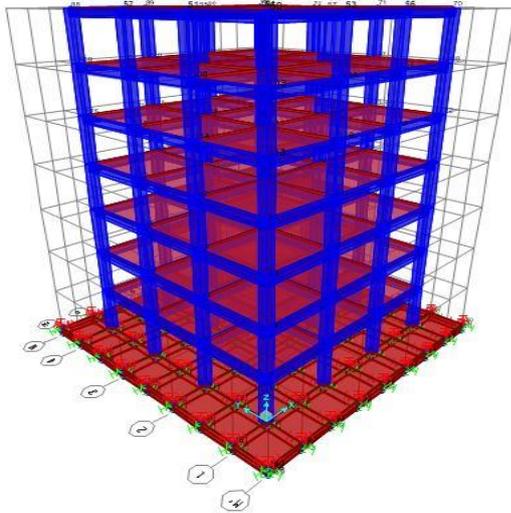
FEM model of five Storey building with fixed Based condition
